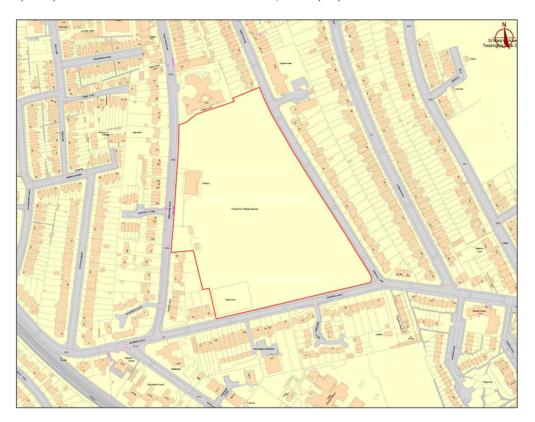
The Development Site (Quantum Group Location Plan - Ref. 900-SK01)
